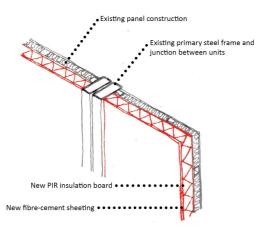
Illustration of solution sets 2 (insulation) and 3 (thermal mass) in a wall at the junction between two steel frames. Original construction shown black, proposed additions shown red.
